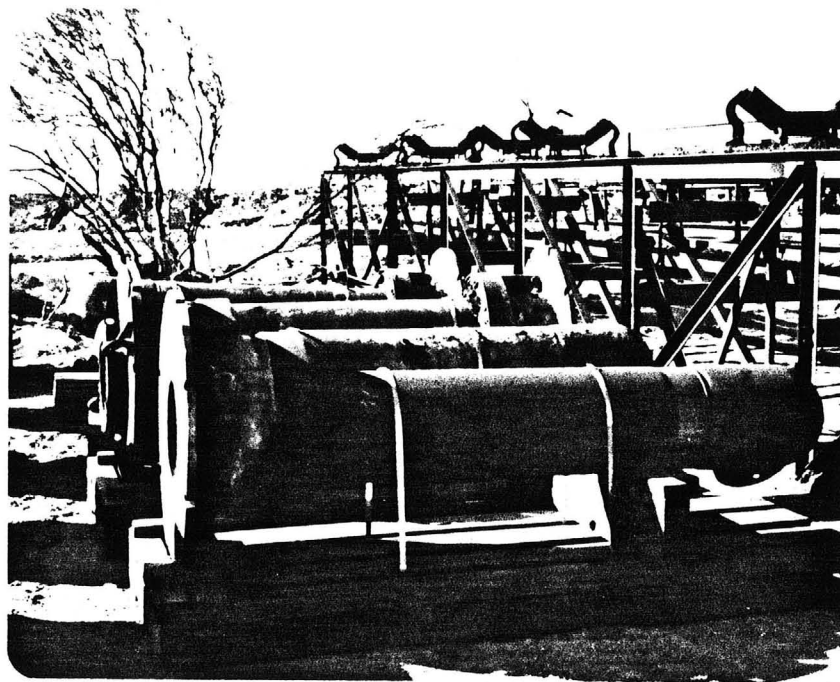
One of two center sections of the Reduction Rotary Kiln.
